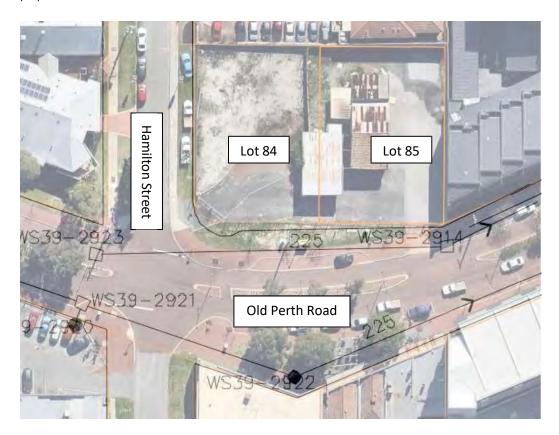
Site Aerial and Town of Bassendean stormwater drainage overlay
